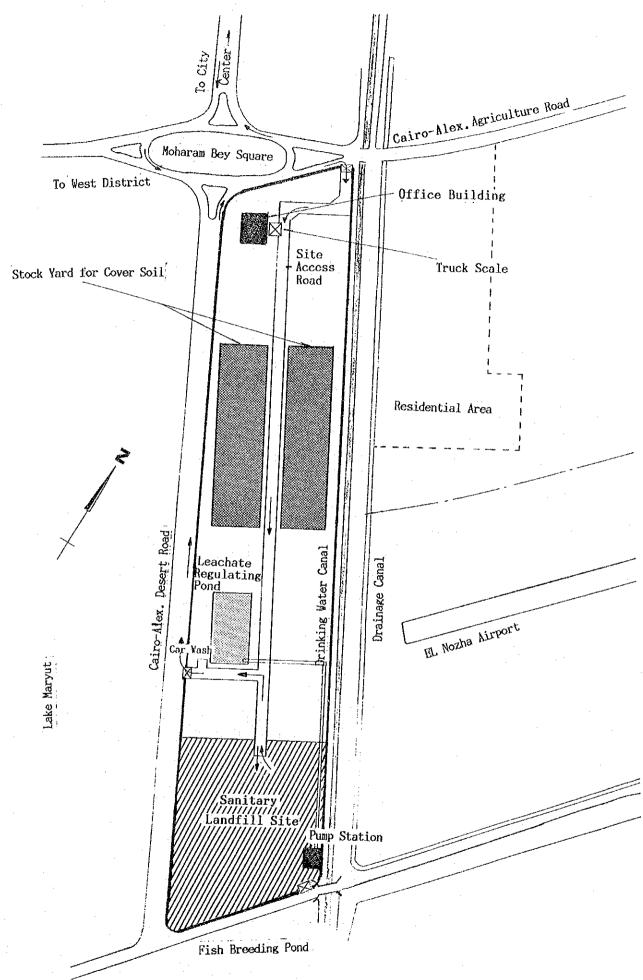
LAYOUT OF FACILITIES IN MBSDS
